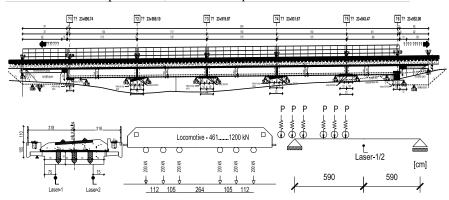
Layout of on-site experiment of bridge structure M1 of rehabilitated railway line Jajinci
